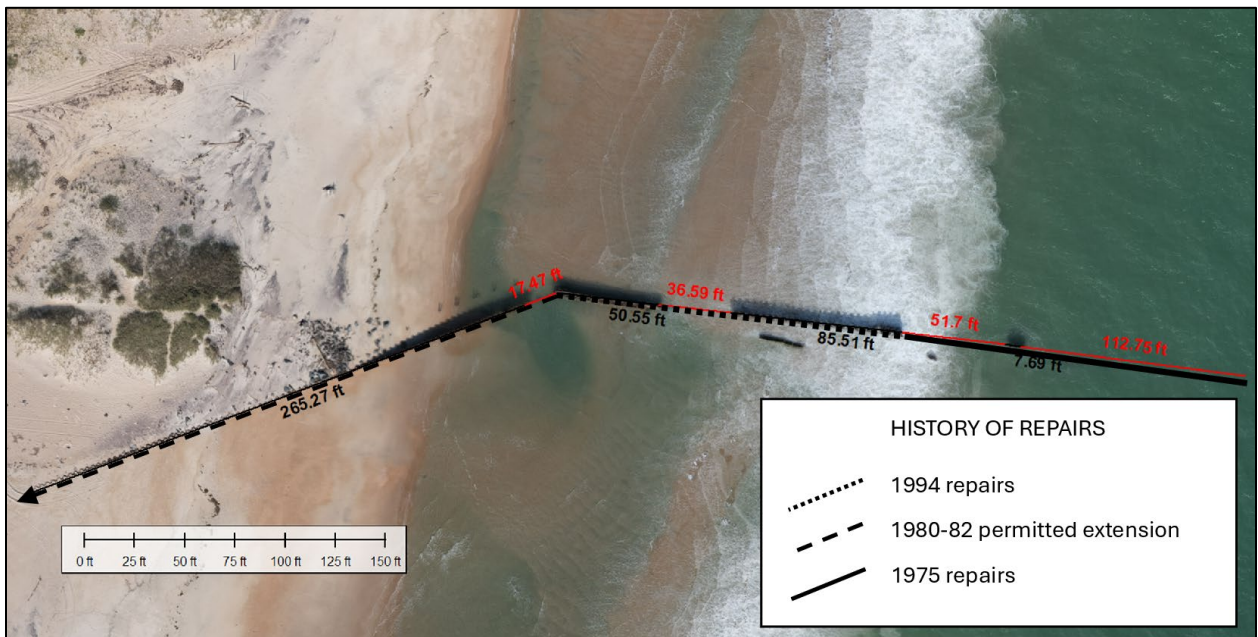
Figure E. Proposed repairs consist of placing sister sheet piles along 640 ft of the original footprint of the structure. Black segments indicate portions of sheet piles remaining in place, while red sections indicate portions of sheet pile lying below MSL (eg heavily damaged).
